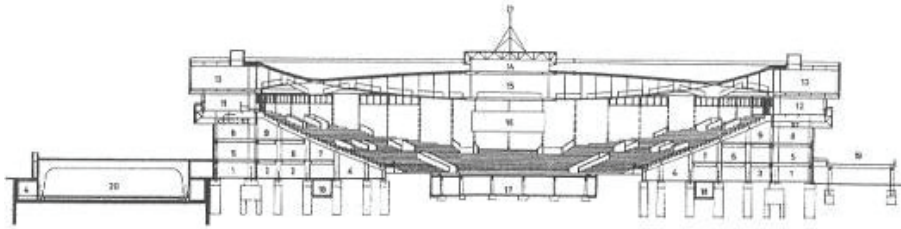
CROSS-SECTION OF THE BUDAPEST SPORTS-HALL Ground-floor circular gallery, level for competitors, contributors; 2. Changing rooms, showers; 3. Offices; 4. Ventilating engine compartment; 5. 1st floor circular gallery, arena's chief entrance level; 6. Cloak-rooms; 7. Toilets; 8. 2nd floor circular gallery, arena's entrance level; 9. Vending machines, toilets; 10. Ring ducts in the ceiling; 11. Box of honour and parlour; 12. Pressroom, press-boxes; 13. Level for machines; 14. Opeion (fanlight in the roof); 15. Loft for cables; 16. Score-board; 17. Store under the arena; 18. Engineering tube tunnel; 19. Cloister; 20. Ice rink for training and hall; 21. TV antenna
